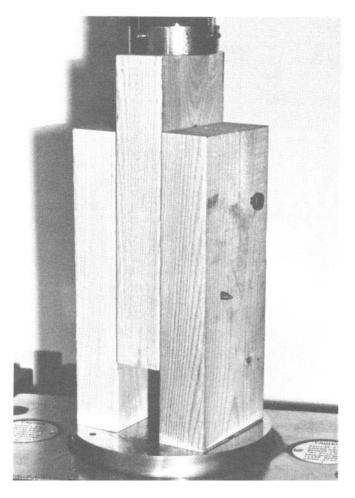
Joint test apparatus, Nordtest, loading double-shear joint in compression. Nailheads were 0.2-0.4 inch above the wood member. (M 150804-3)
